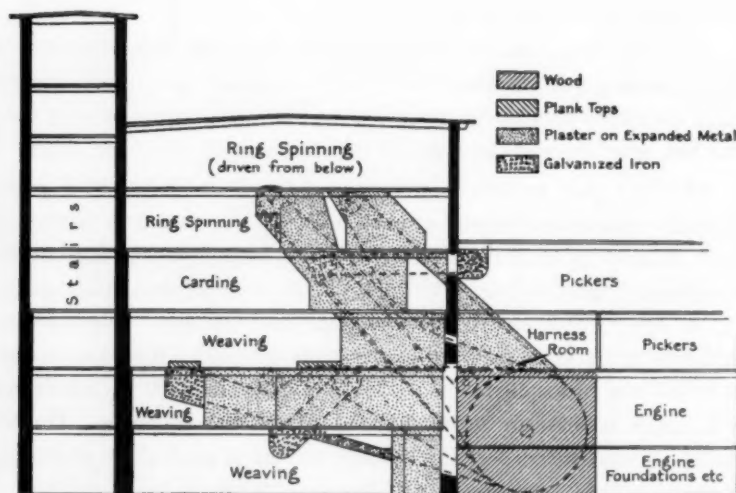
SECTION SHOWING MAIN DRIVE AS NOW PROTECTED BY FIRE RETARDANT ENCLOSURES
